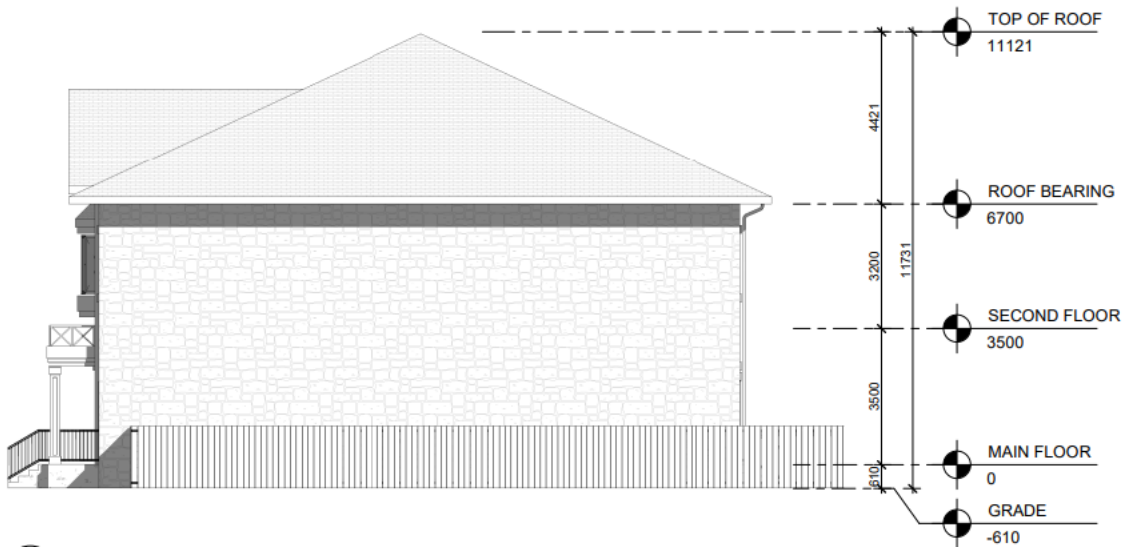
South view – Interior side yard end facing 231 Tanbark Road
